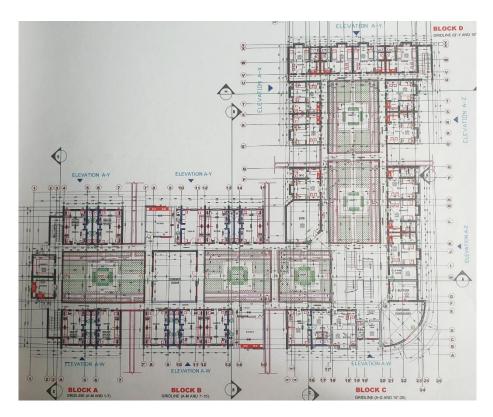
Plate X: Image of the ground floor plan of the hostel Source: PPDU (2023).
